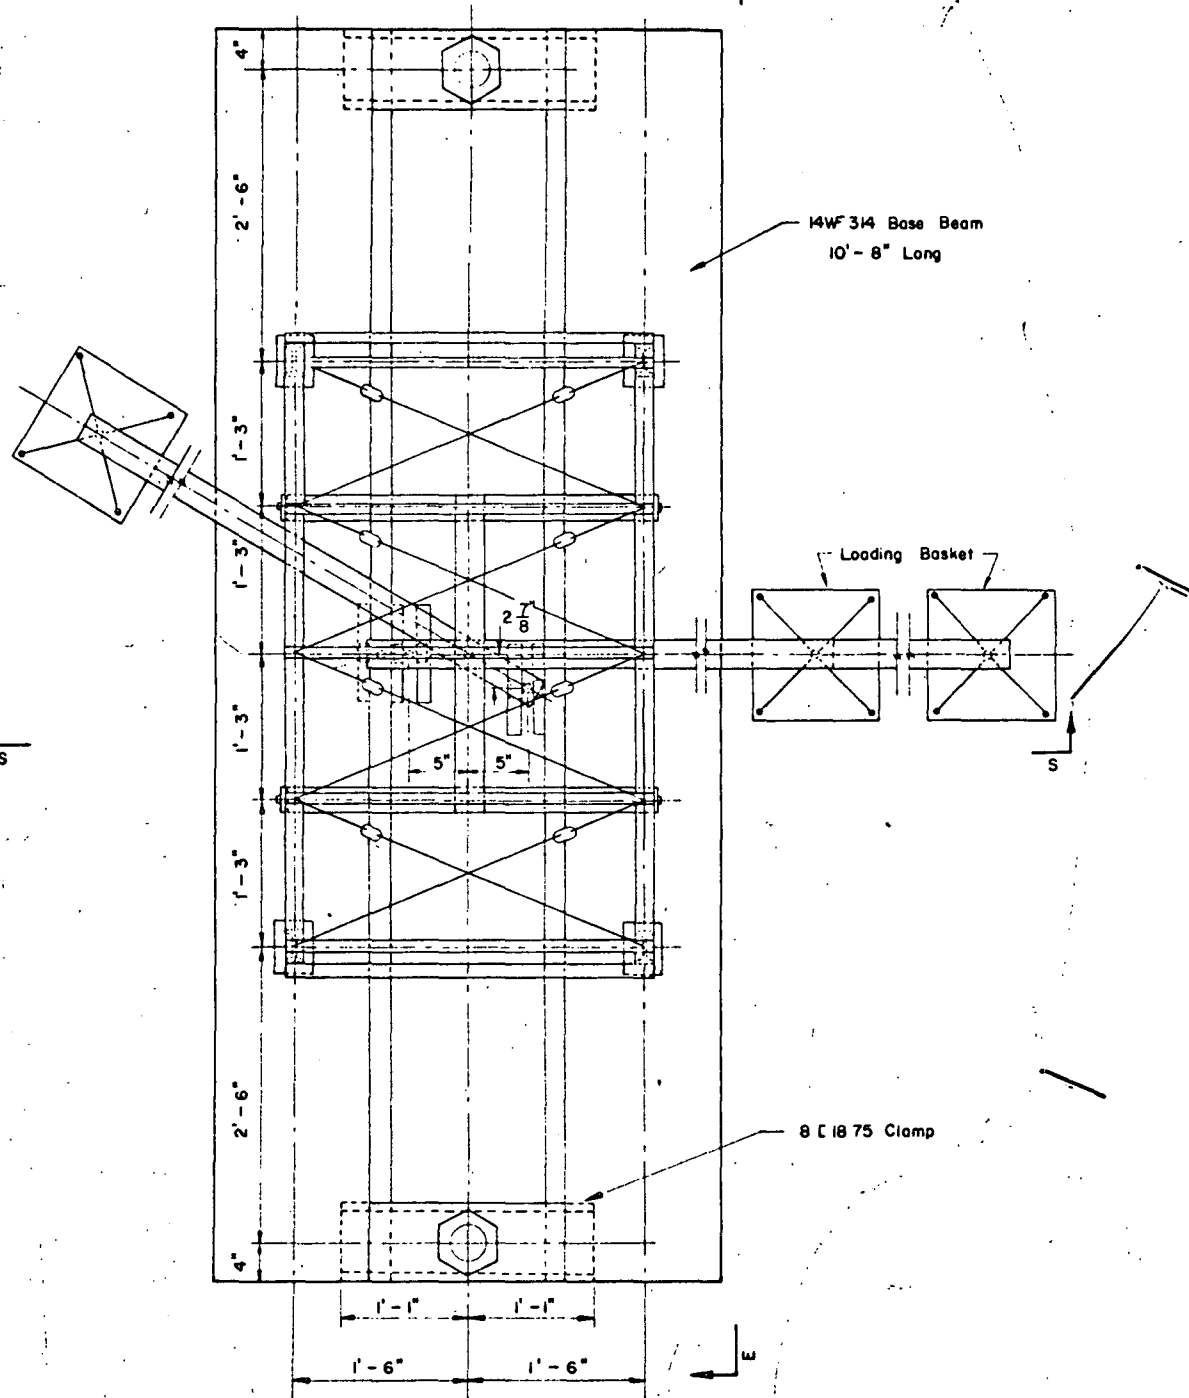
MODEL FRAME TEST SETUP - PLAN
